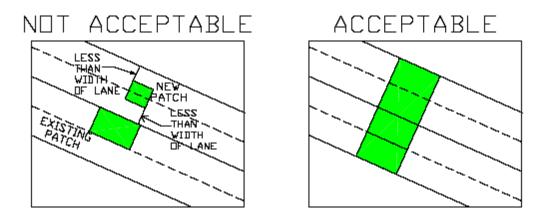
Example 3: Do not leave strips of pavement less than one-half lane in width.
